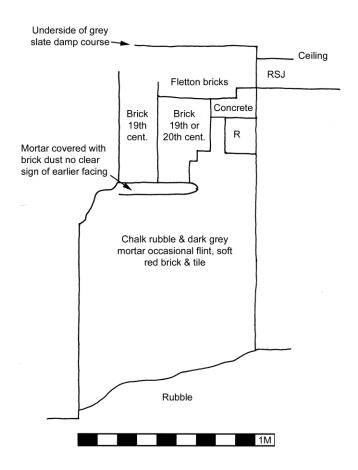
Cellar 8. Section cut through the east wall for a fire escape. Looking south. R = Reigate stone. RSJ – rolled steel joist.
